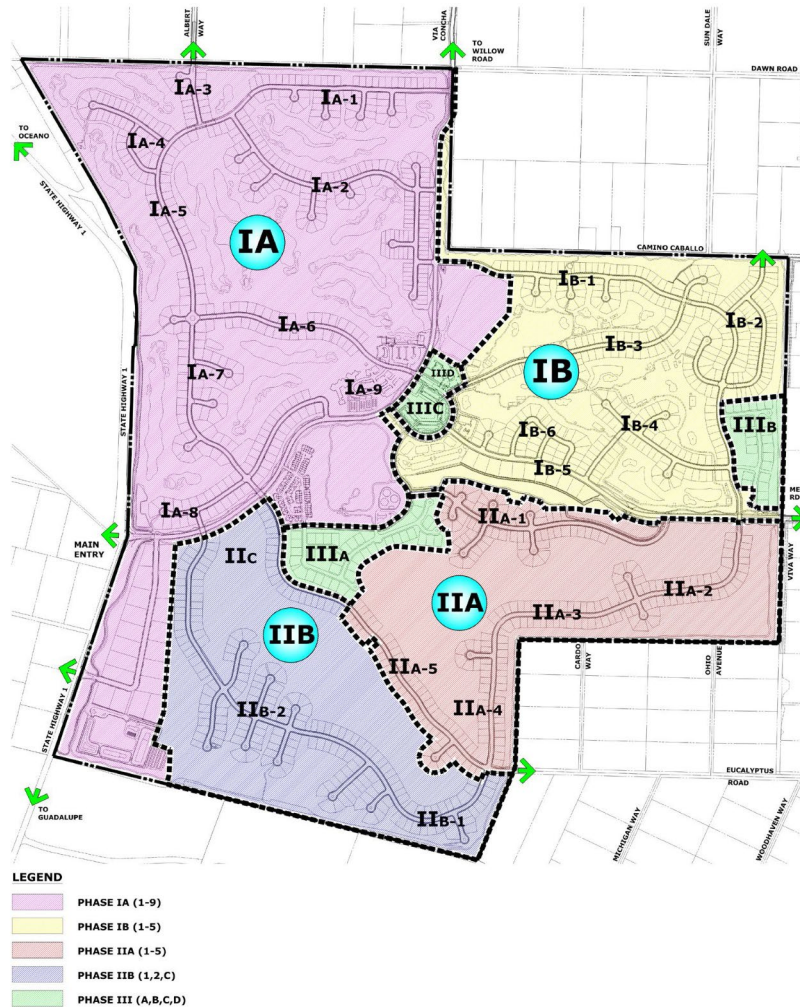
Monarch Dunes Specific Plan Phasing Plan, amended, June 6, 2023
